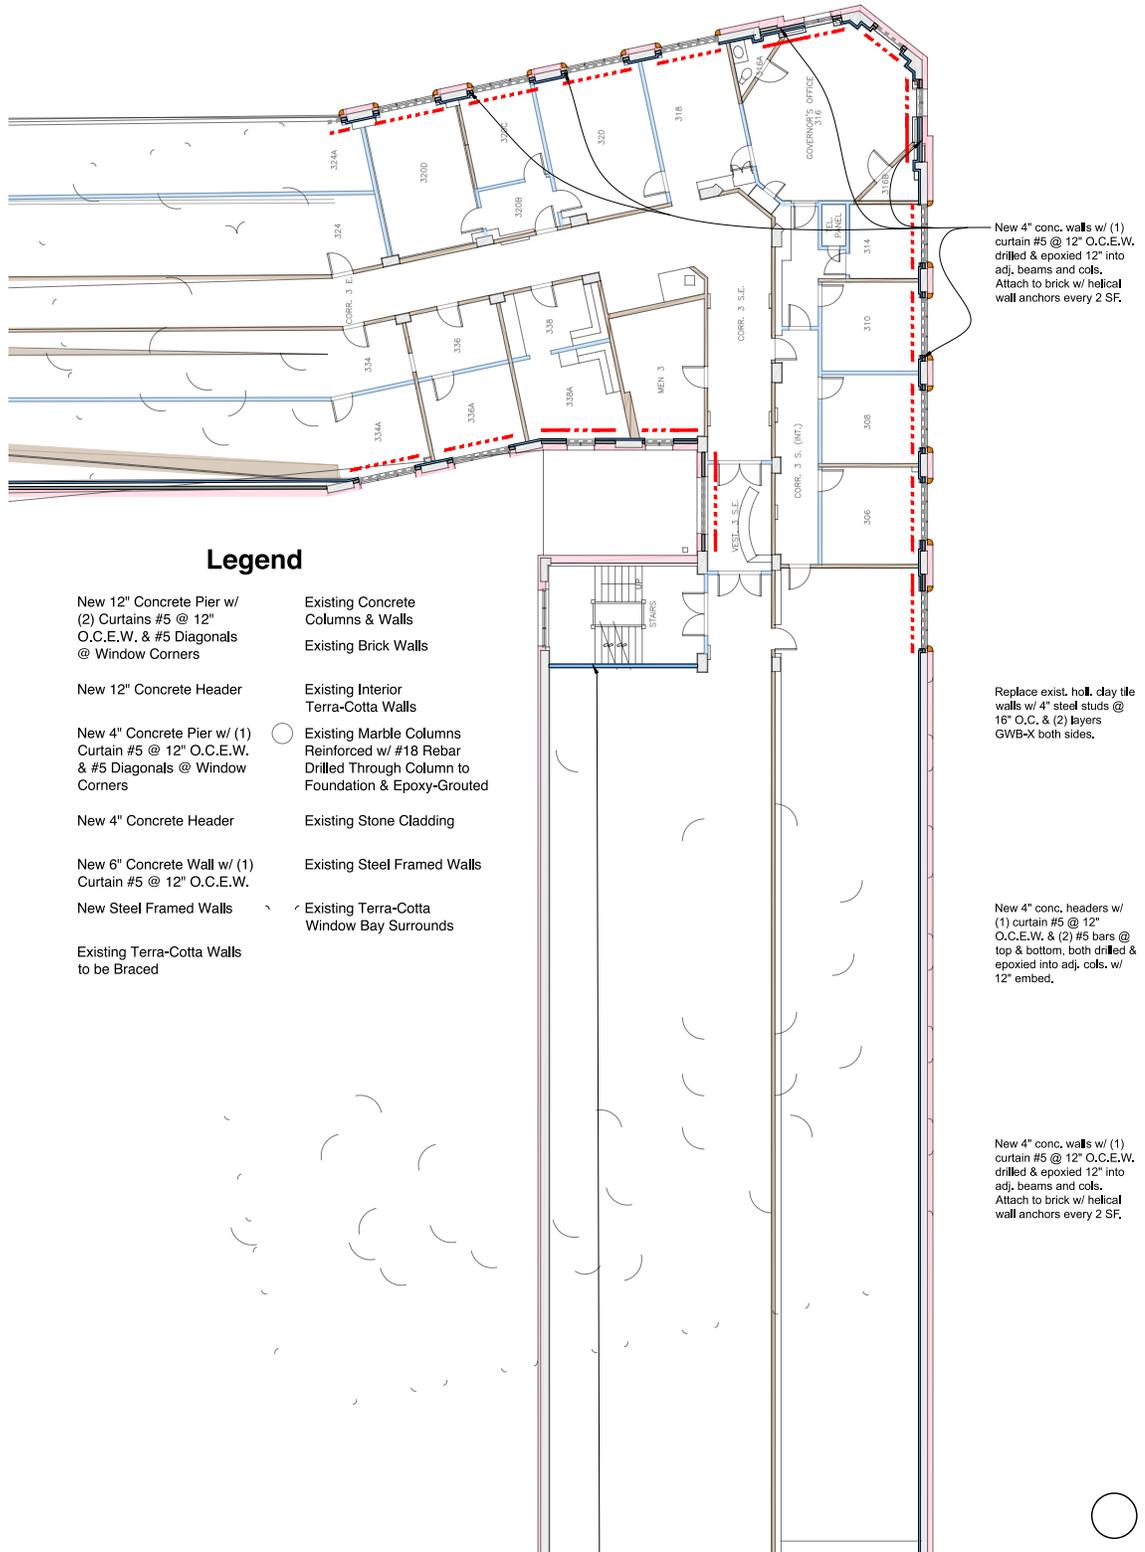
(6): Structural Reinforcing of Building Frame - Floor Level 3
